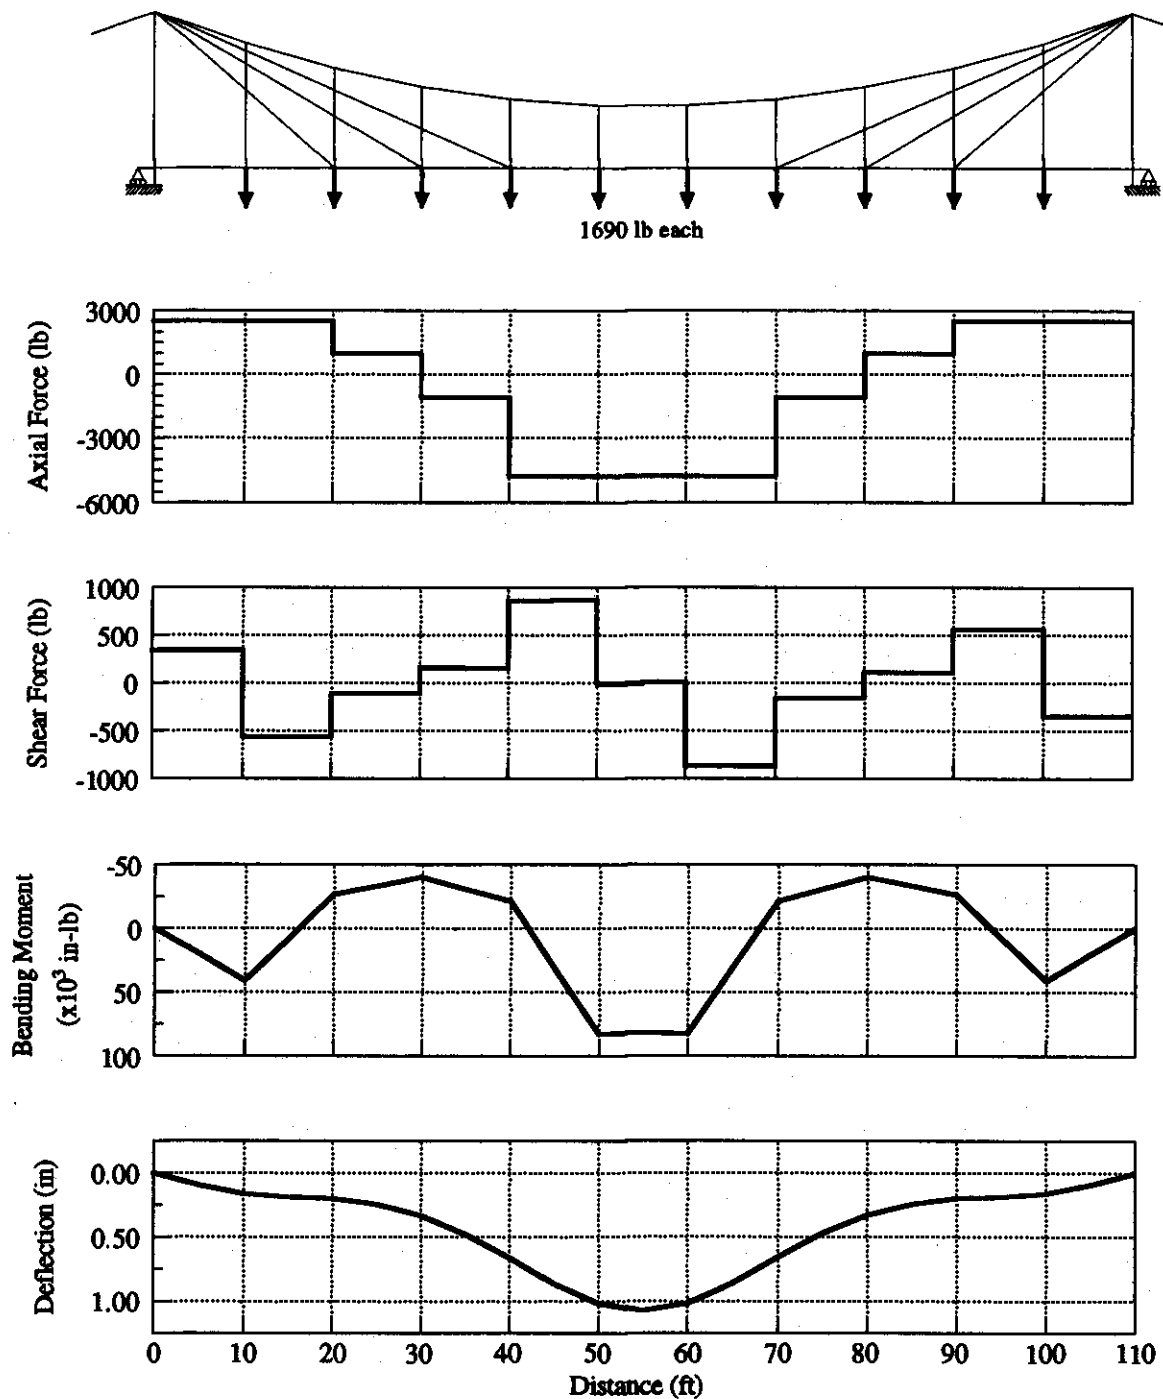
Dead Load Forces and Deflections in Deck of Rock Church Bridge with Lightly Stiffened Deck
